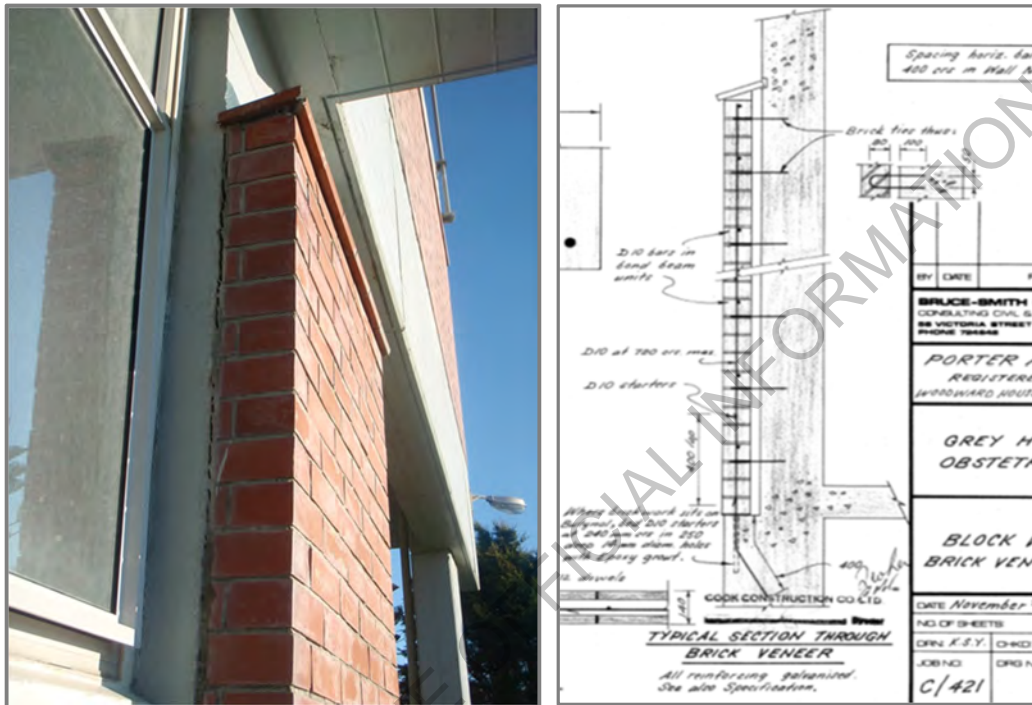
Gap between concrete pier and the brick veneer cladding- Lower Ground Level
